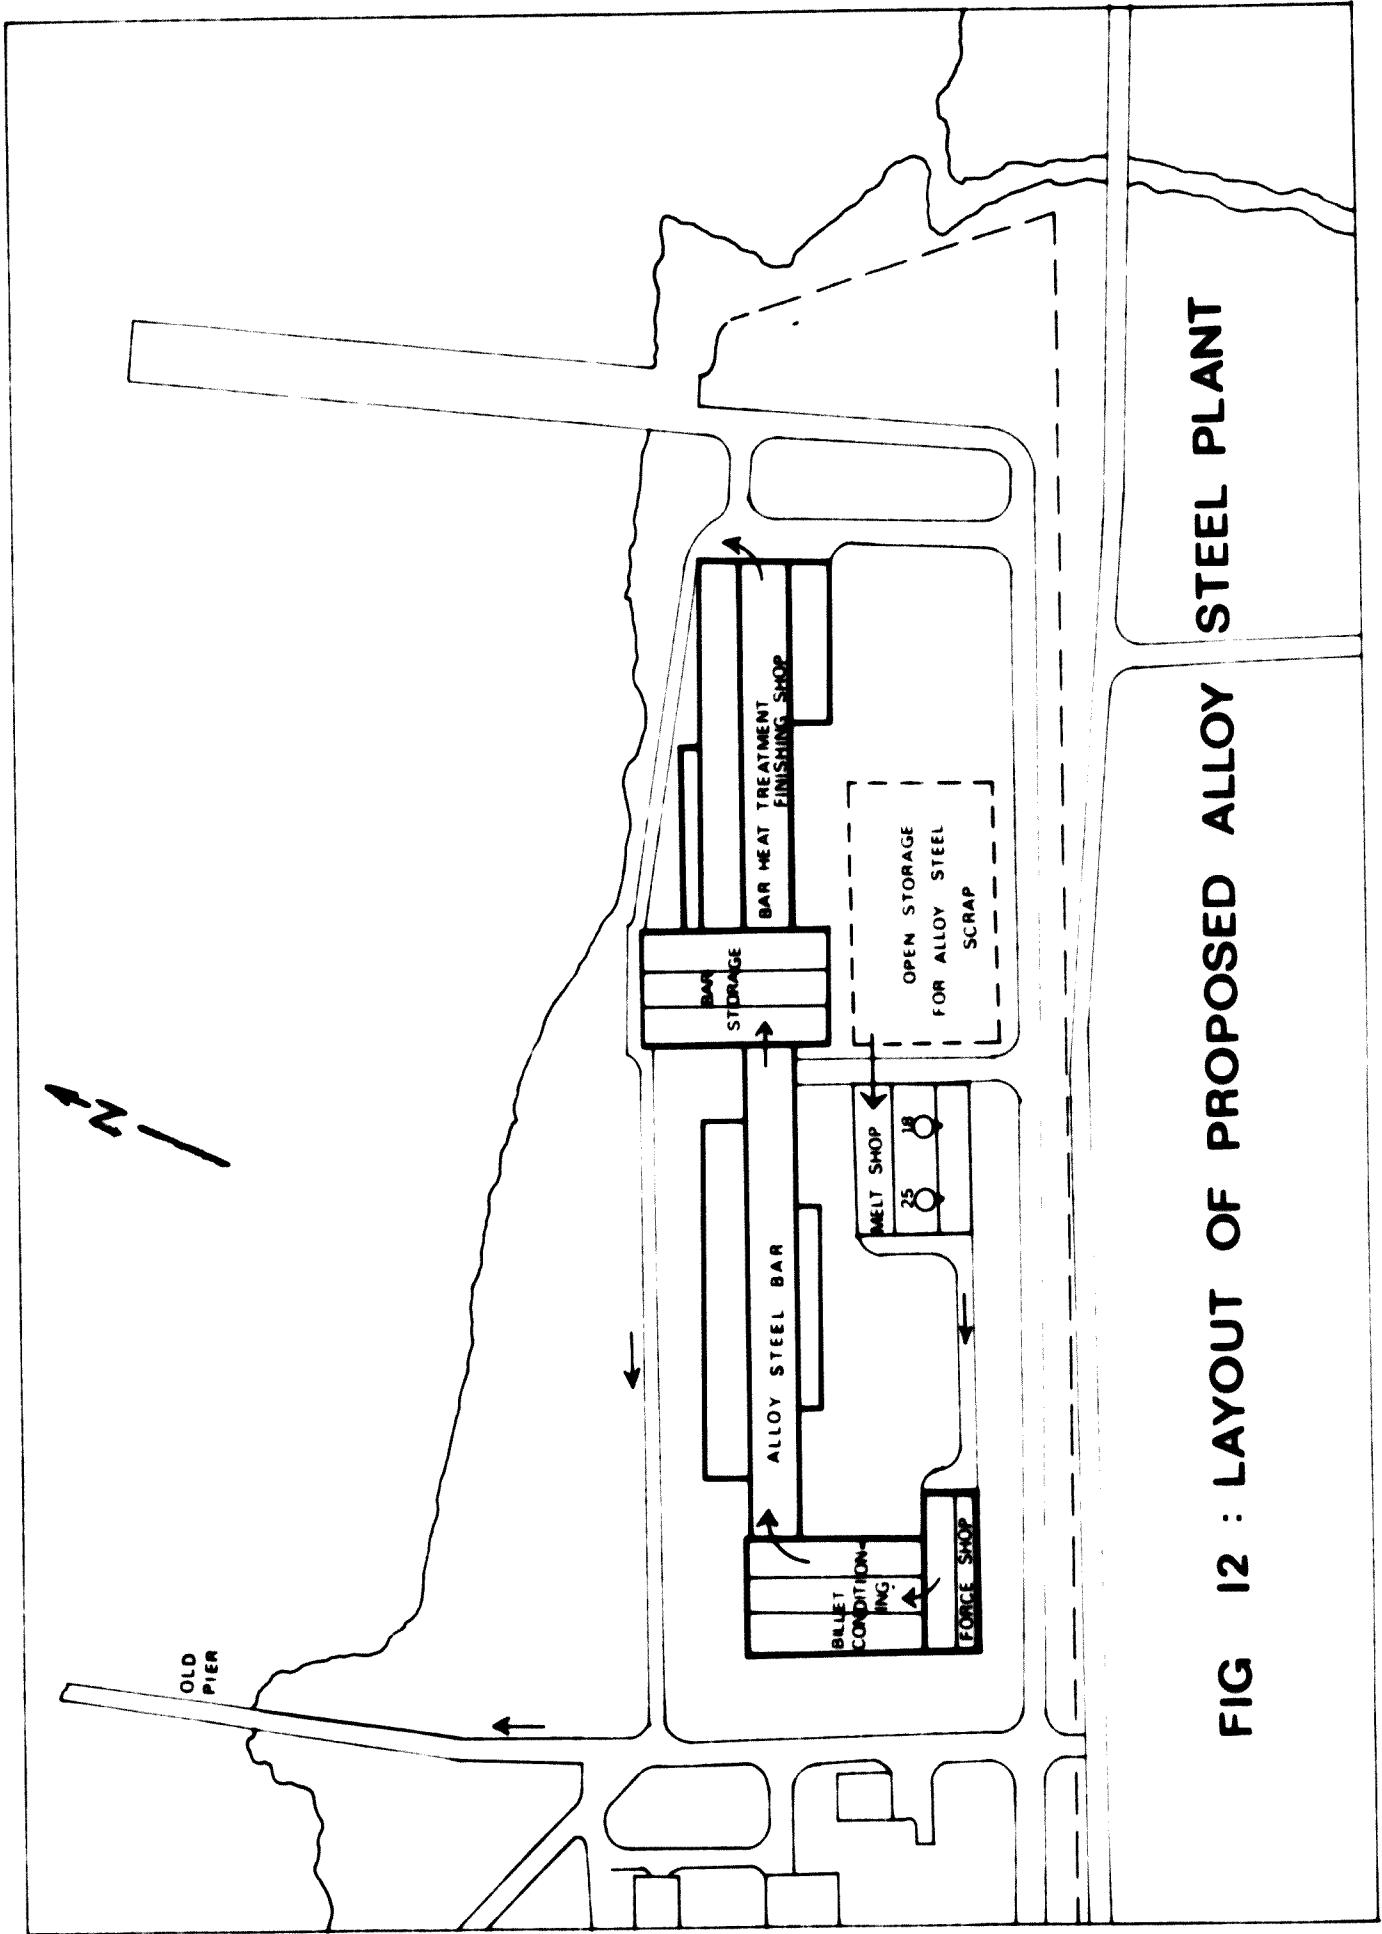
LAYOUT OF PROPOSED ALLOY STEEL PLANT
